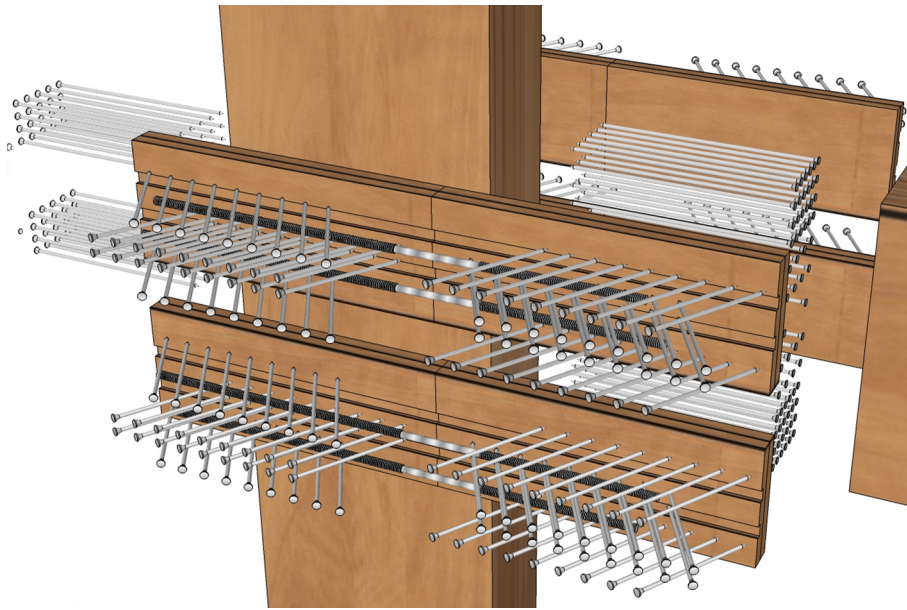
Exploded view of Timber Plus Dissipater installed using inclined screws
